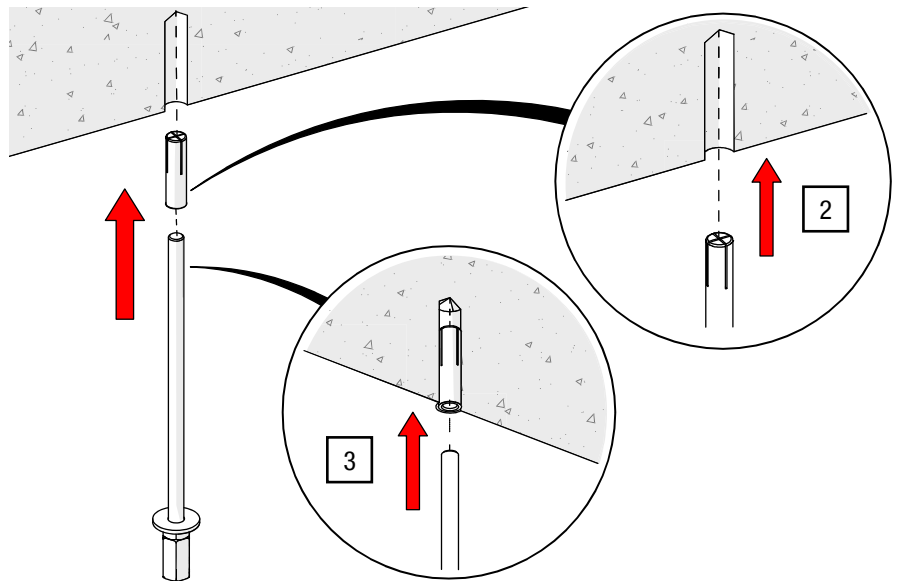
Ceiling suspension – Mount drive-in anchor and threaded rod
